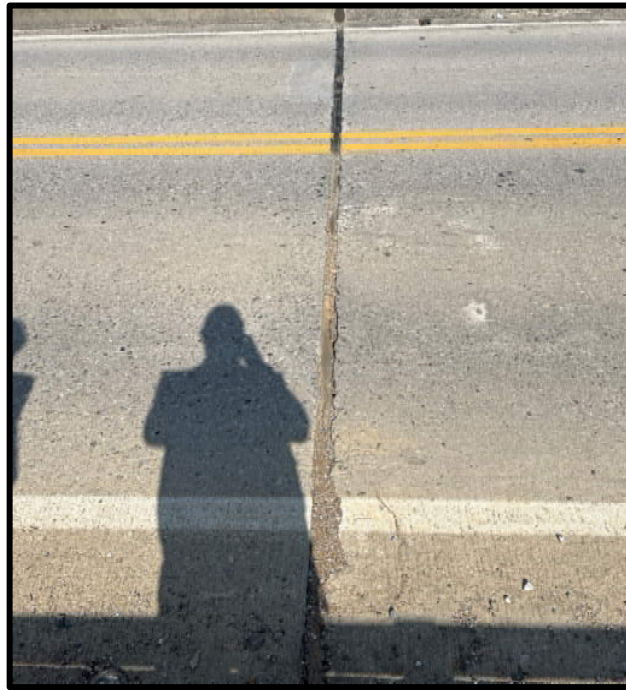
Joint at Bent 2 – Debris Build-up (typ. all joints) and Ripping
